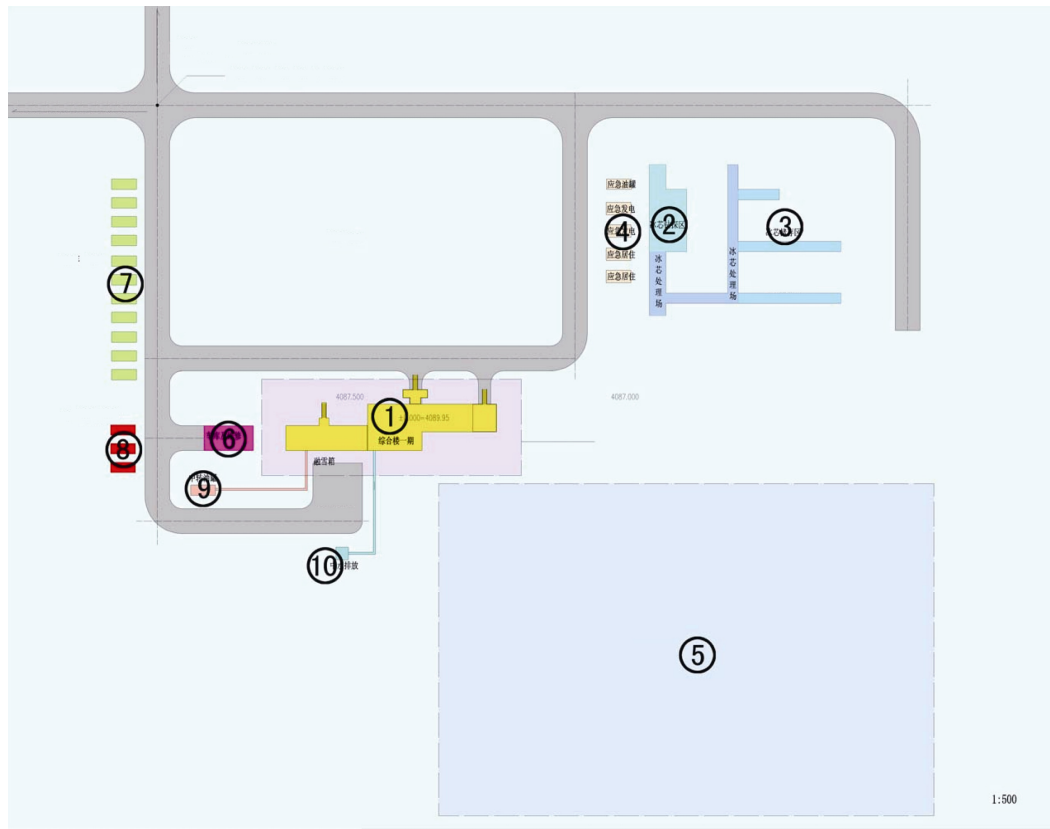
Plan of the station area: (1) main building, (2) ice-core drilling site, (3) ice-core storage, (4) emergency container, (5) scientific observation area, (6) garage and maintenance area, (7) vehicle parking, (8) storage area, (9) oil tank, and (10) drainage pit.
